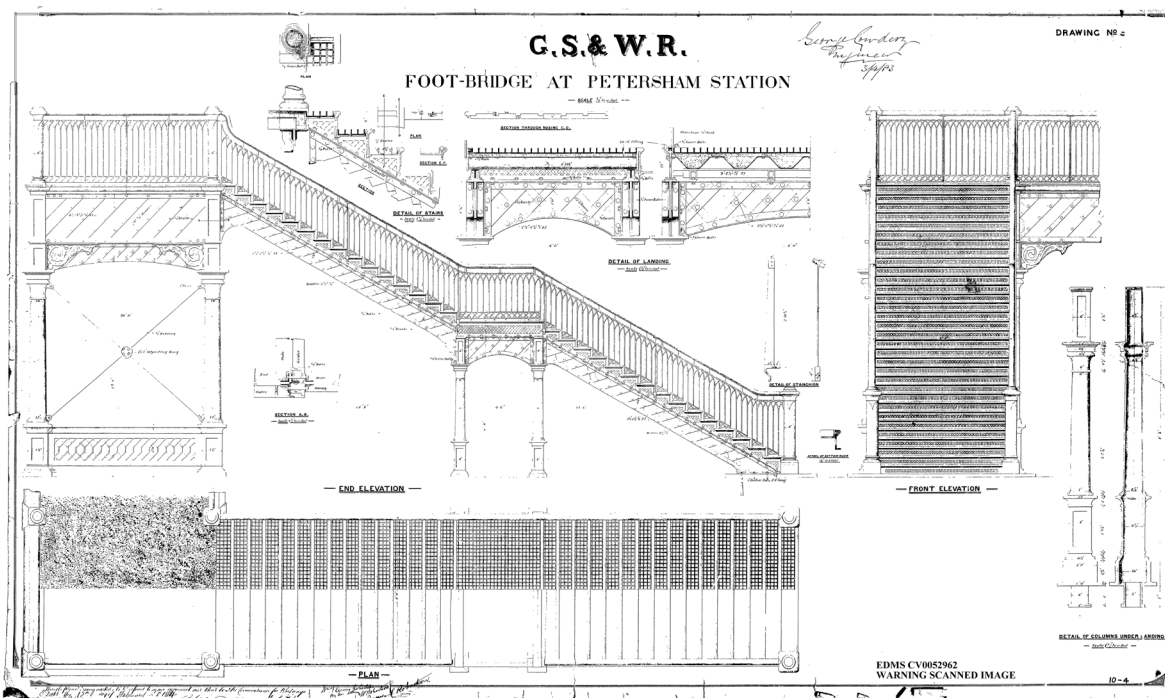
Footbridge at Petersham Station plan 1883. Source: TfNSW
